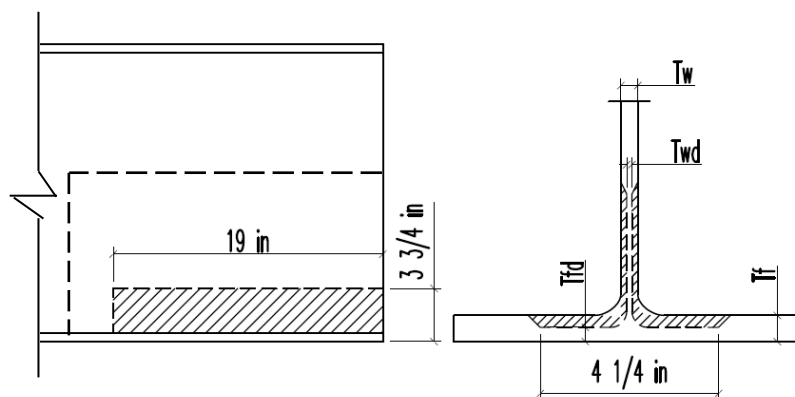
Section Reduction Pattern Utilized in the Damaged and Repaired Girders
